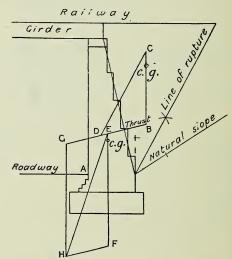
Section through Bridge Abutment, showing Method of Designing.
